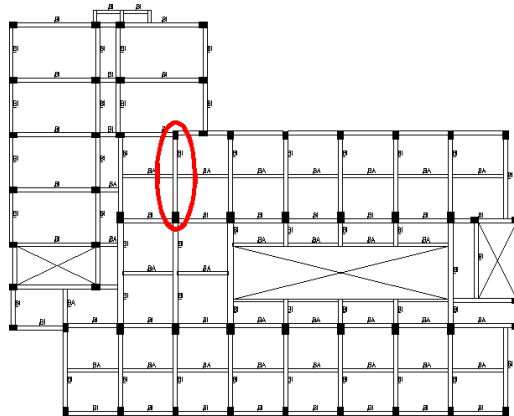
Layout Plan of the Reviewed U-Shell Beam
